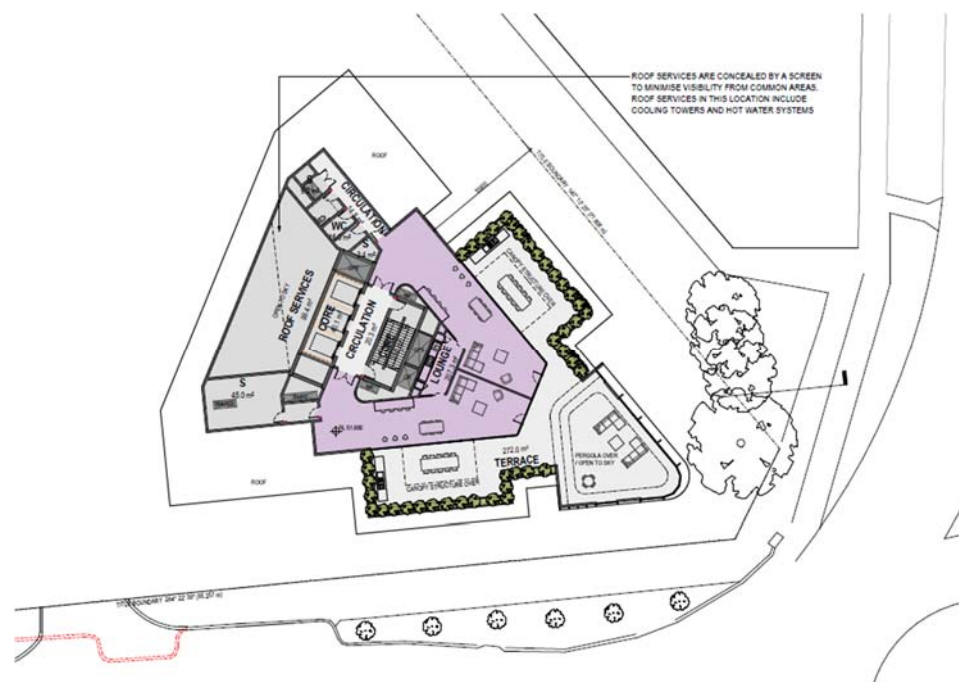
ROOFPLAN EXTRACT SHOWING AC DECK
